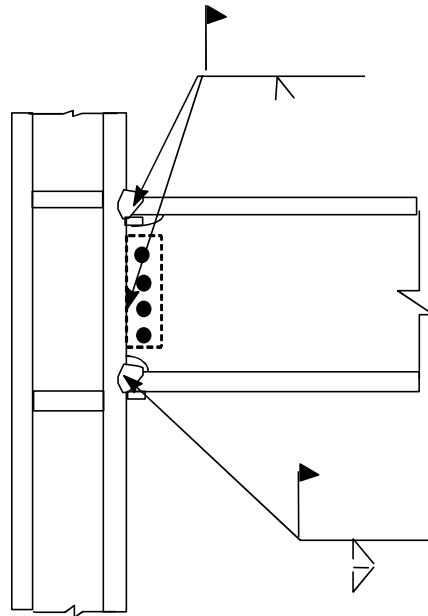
Typical Bolted Web, Welded Flange Connection
